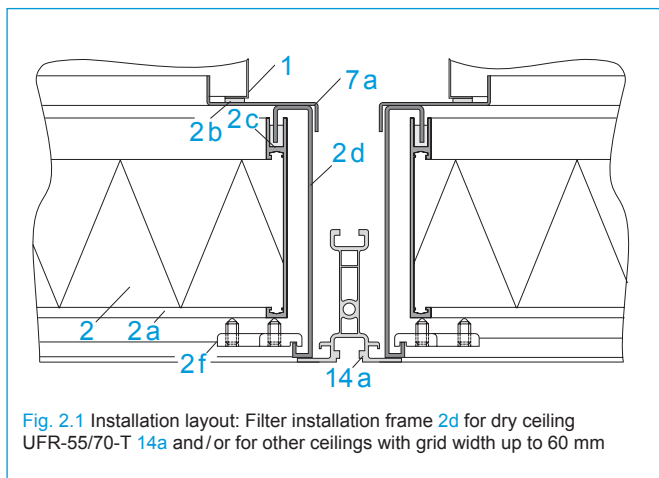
Installation layout: Filter installation frame 2d for dry ceiling UFR-55/70-T 14a and/or for other ceilings with grid width up to 60 mm
